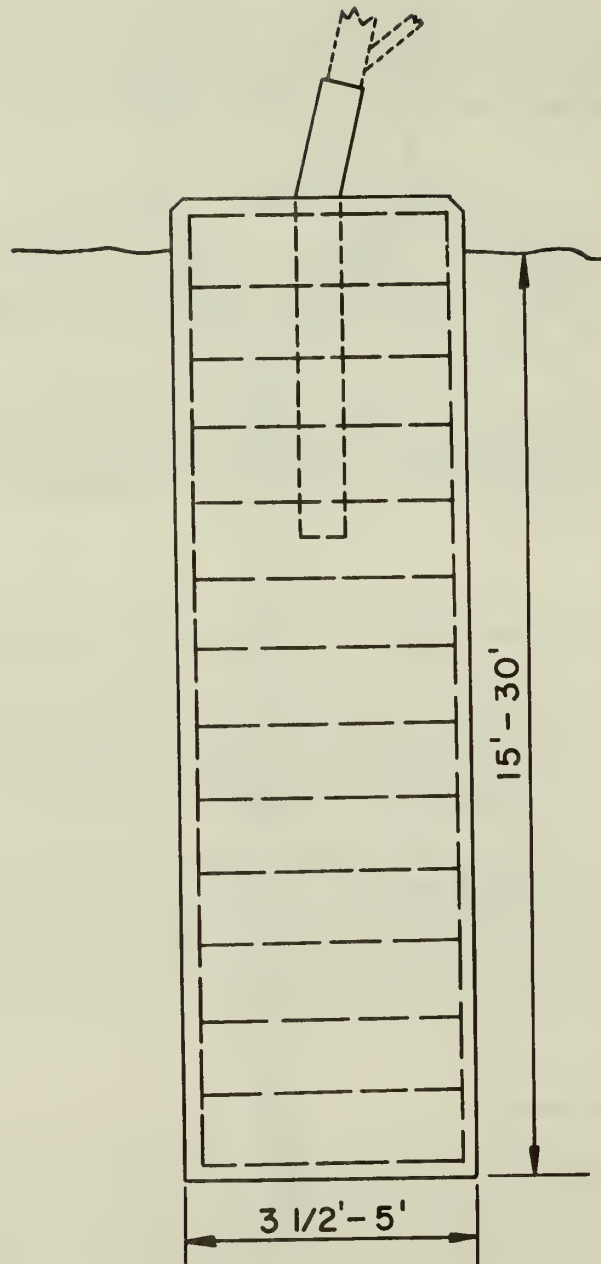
Drilled Shaft Foundation for Steel Lattice Structure.
